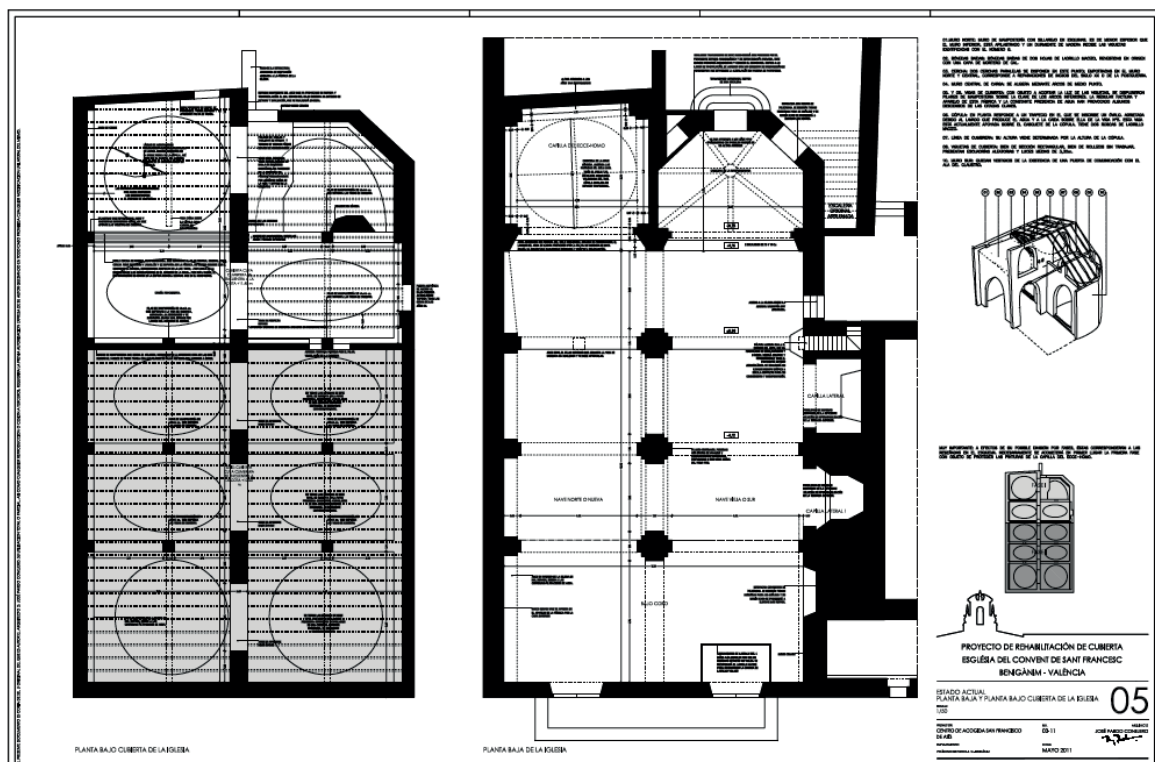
Floor plan and roof structure of the church. (Source: authors).
